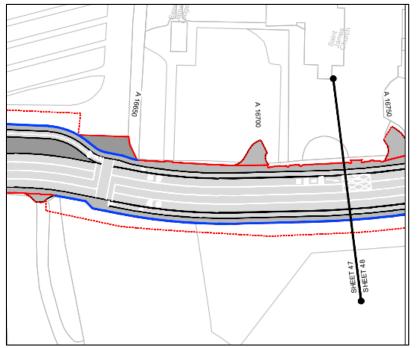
Extract from Boundary Treatment Drawing at Beauchamp House (Sheet 47)
